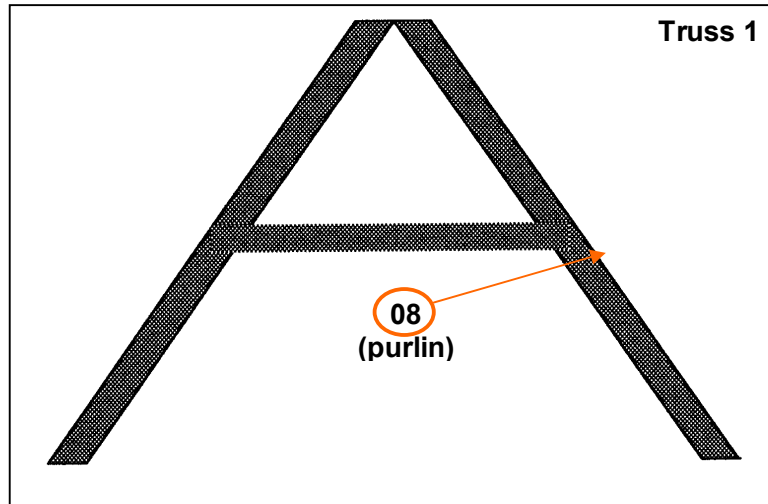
i: Main or stables range roof trusses to show sample locations (viewed from east looking west)
